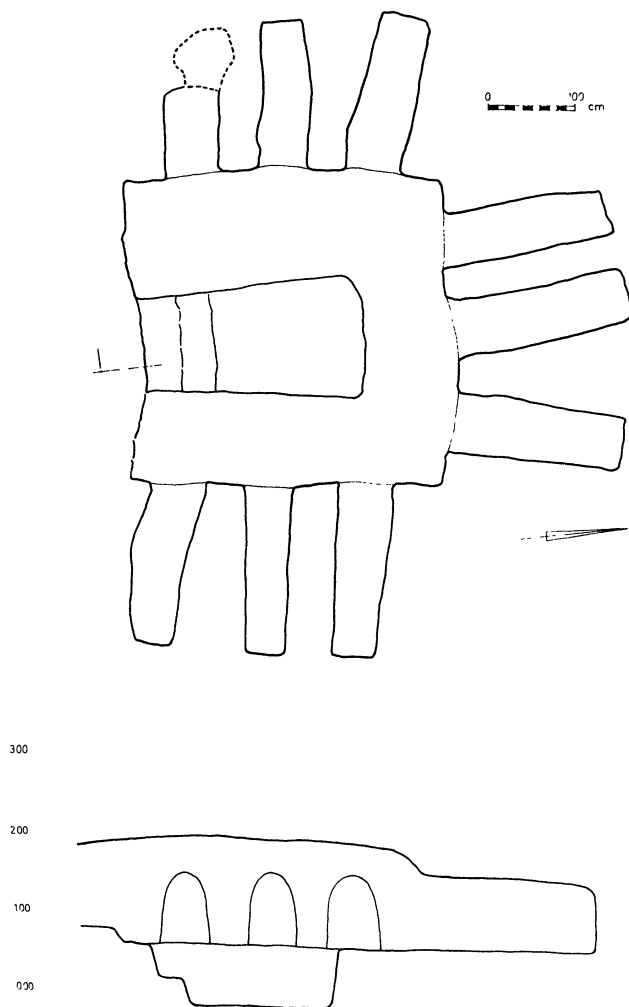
Floor plan of a tomb from the Jewish necropolis at Jericho (top) and section of wall at bottom of plan showing loculus entrances (bottom).
